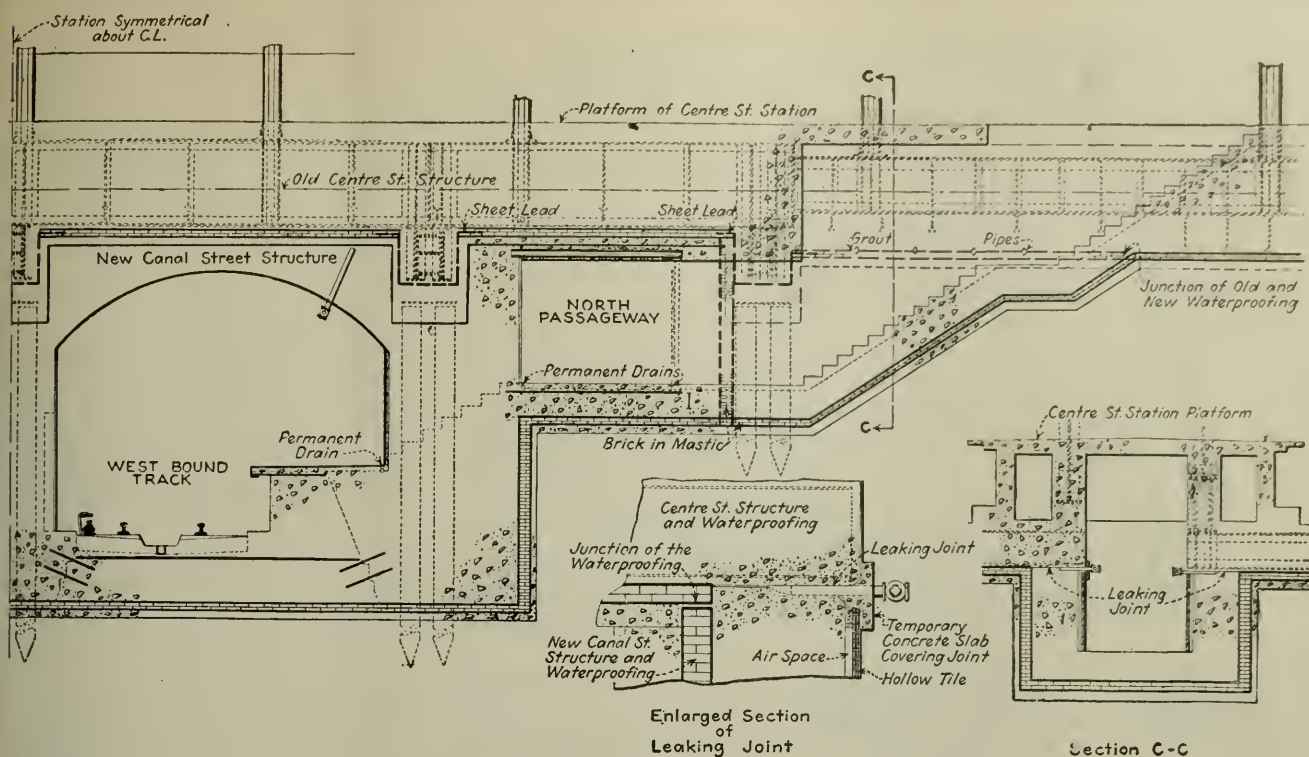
WATERPROOFING AT STAIRWAY JOINTS—NORTH-SOUTH SECTION ALONG CENTRE ST.
